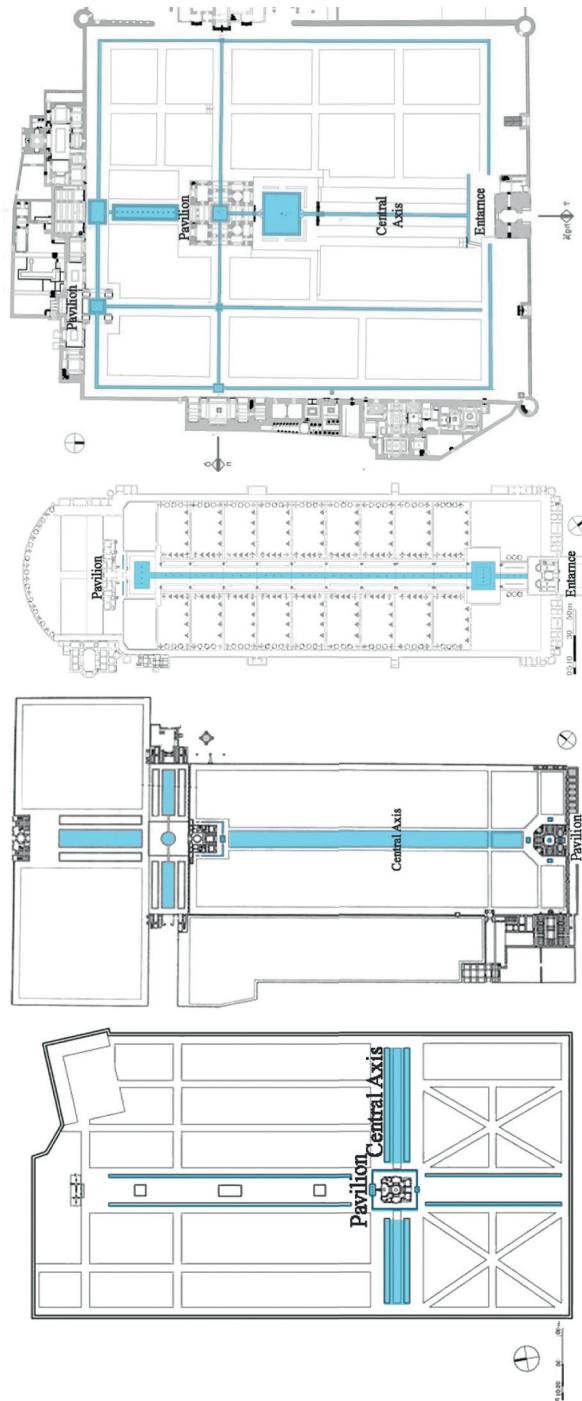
a. Hash Behesht Garden Plan; b. Dolatabad Garden plan. c. Shazdeh Garden Plan; d. Fin Garden Plan.
